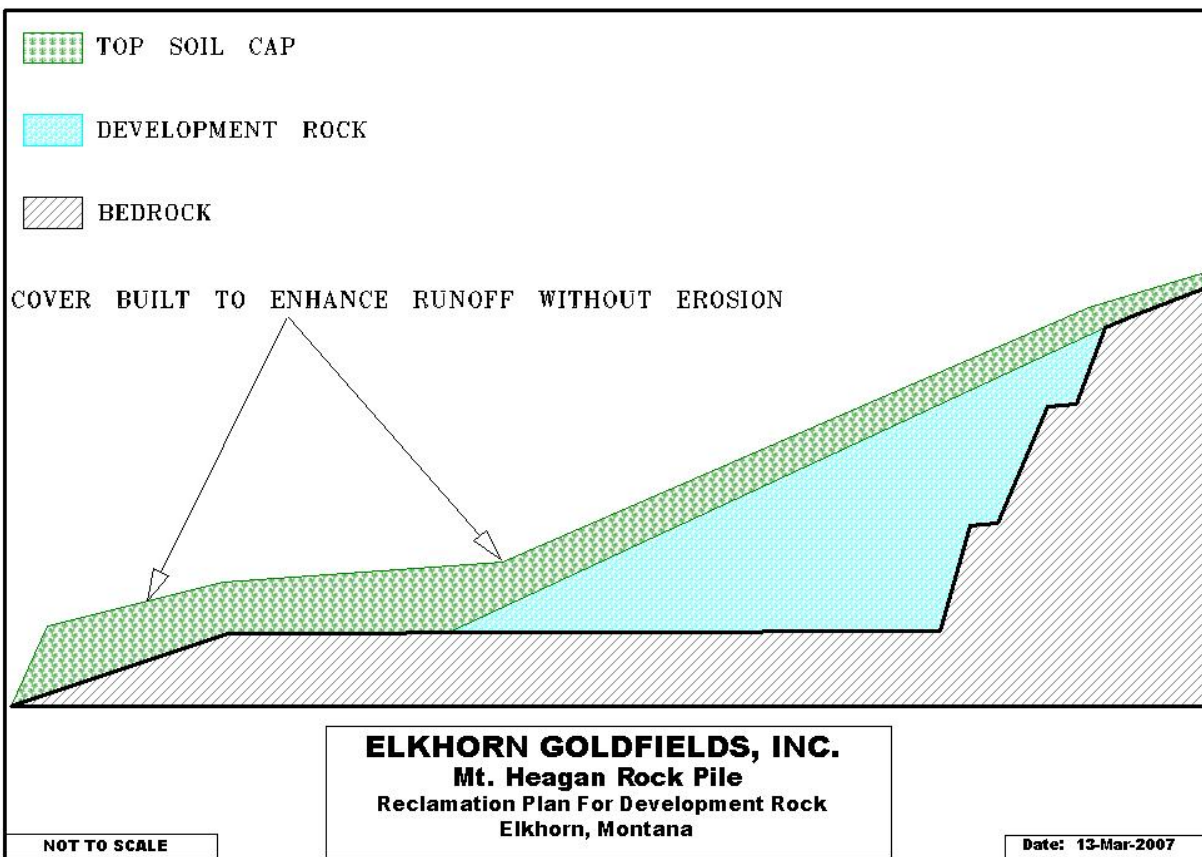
Mt.. Heagan Pit Backfill Reclaim Schematic.
